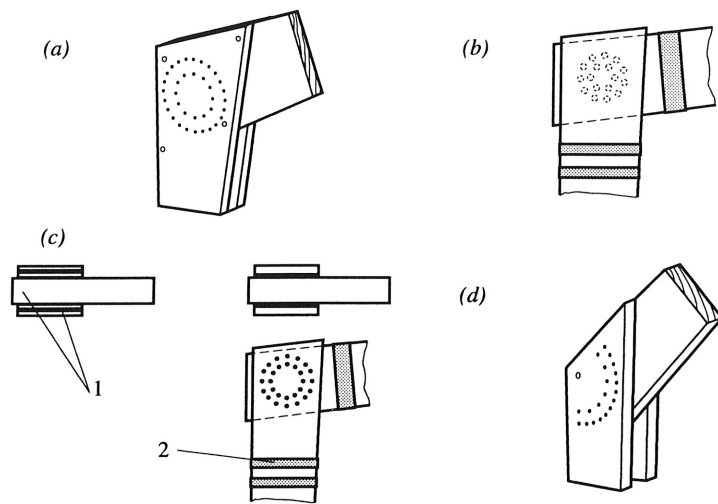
Frames with mechanically jointed members: (a) typical frame corner, (b) toothed-plate connectors, (c) reinforcement of members: 1 glued-in rod or 2 glued-on plywood, (d) special arrangement for dowelled joint.
